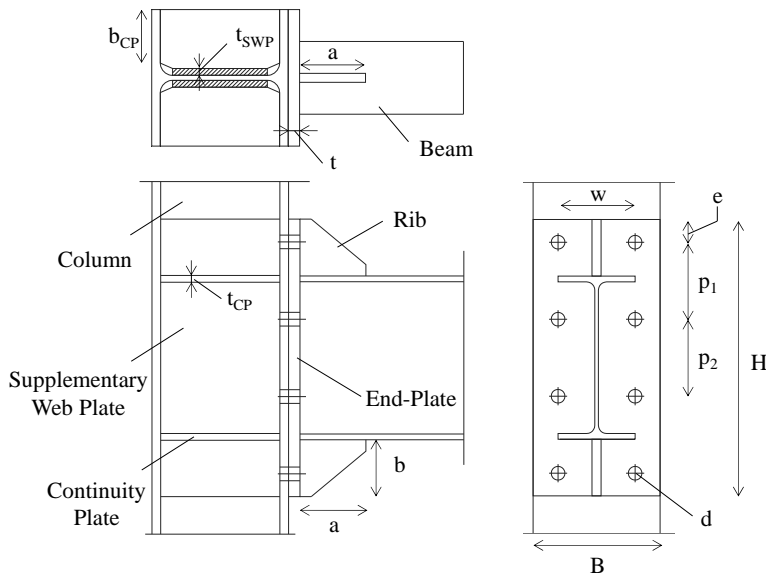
Extended stiffened end plated beam to column joint: main geometric properties.
